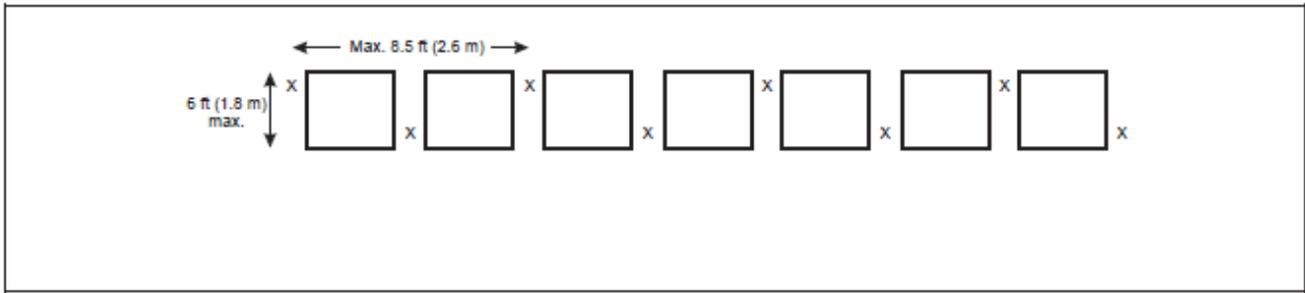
Plan view of alternative in-rack sprinkler arrangement for single-row racks up to 6 ft (1.8 m) deep
